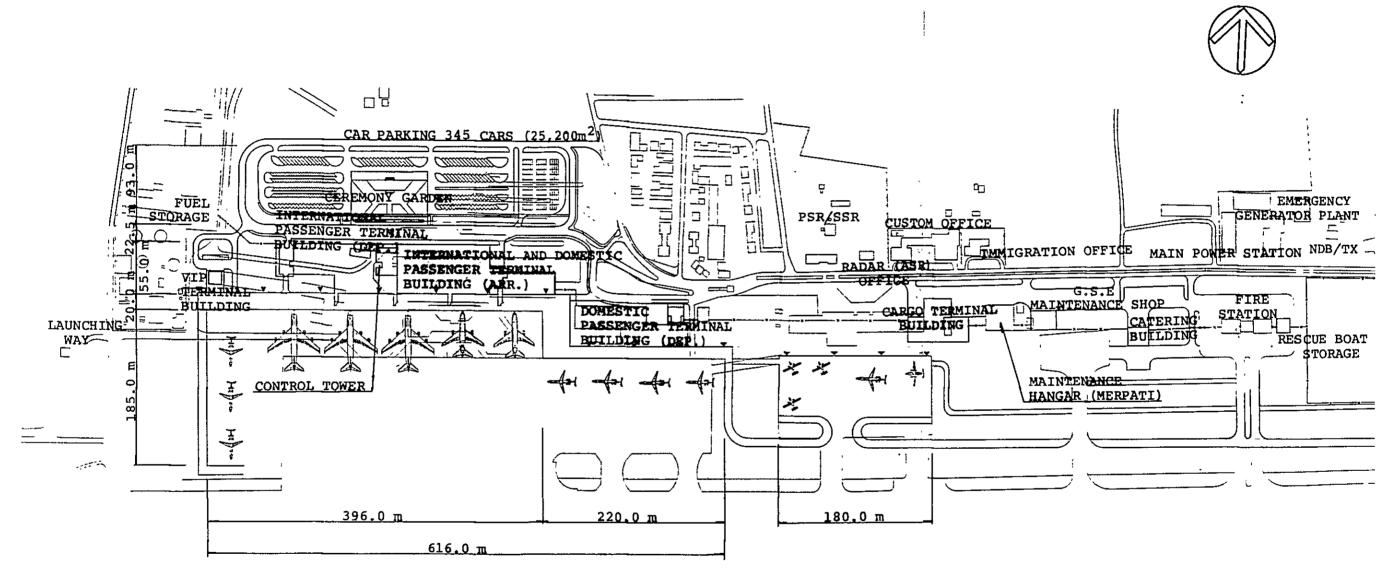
APRON DEVELOPMENT PLANS
